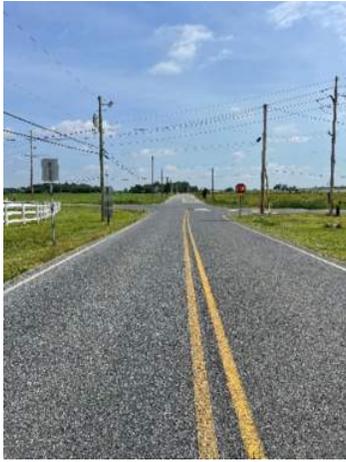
Commissioners Pike (CR 581) looking east toward the intersection.
